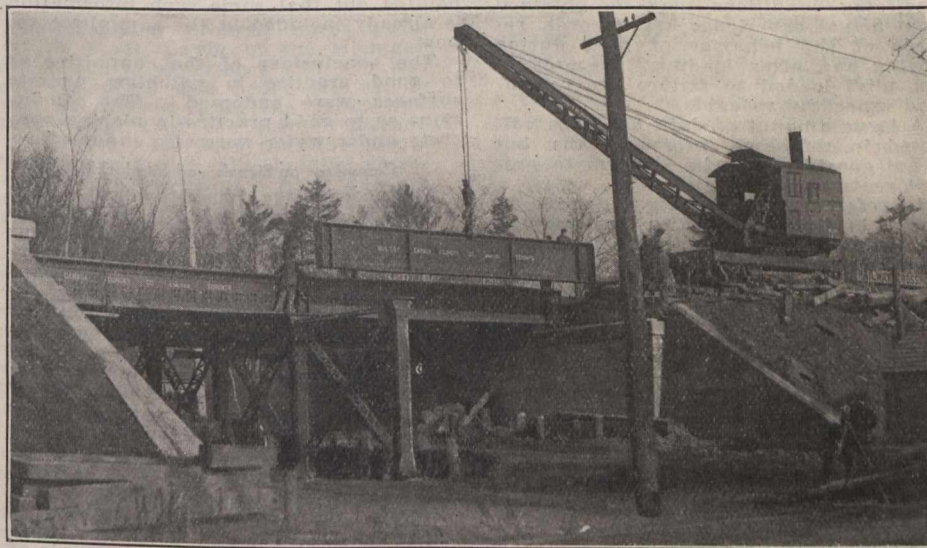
G.T.R. Grade Separation. Locating a Subway Girder.
